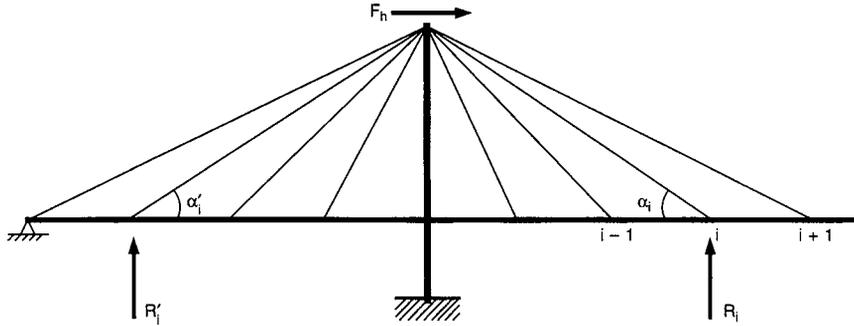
Cables induce a horizontal force F_h at the top of a pylon.
